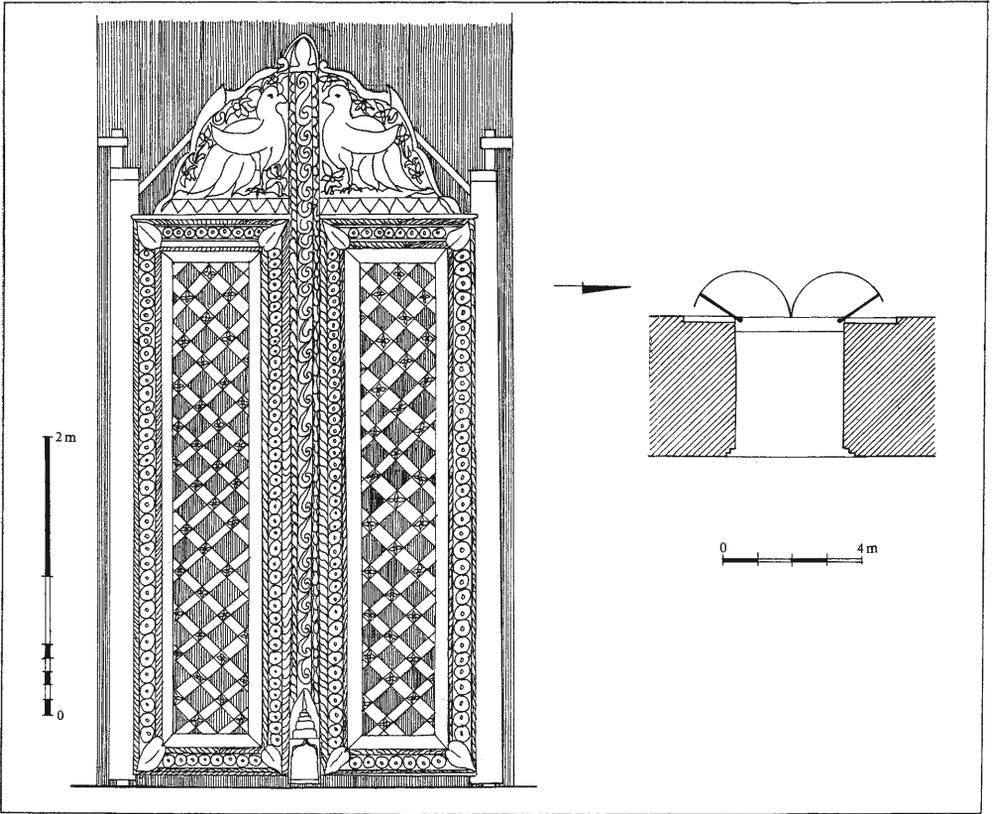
Pagan, temple of Ananda, western interior door, plan and elevation.
